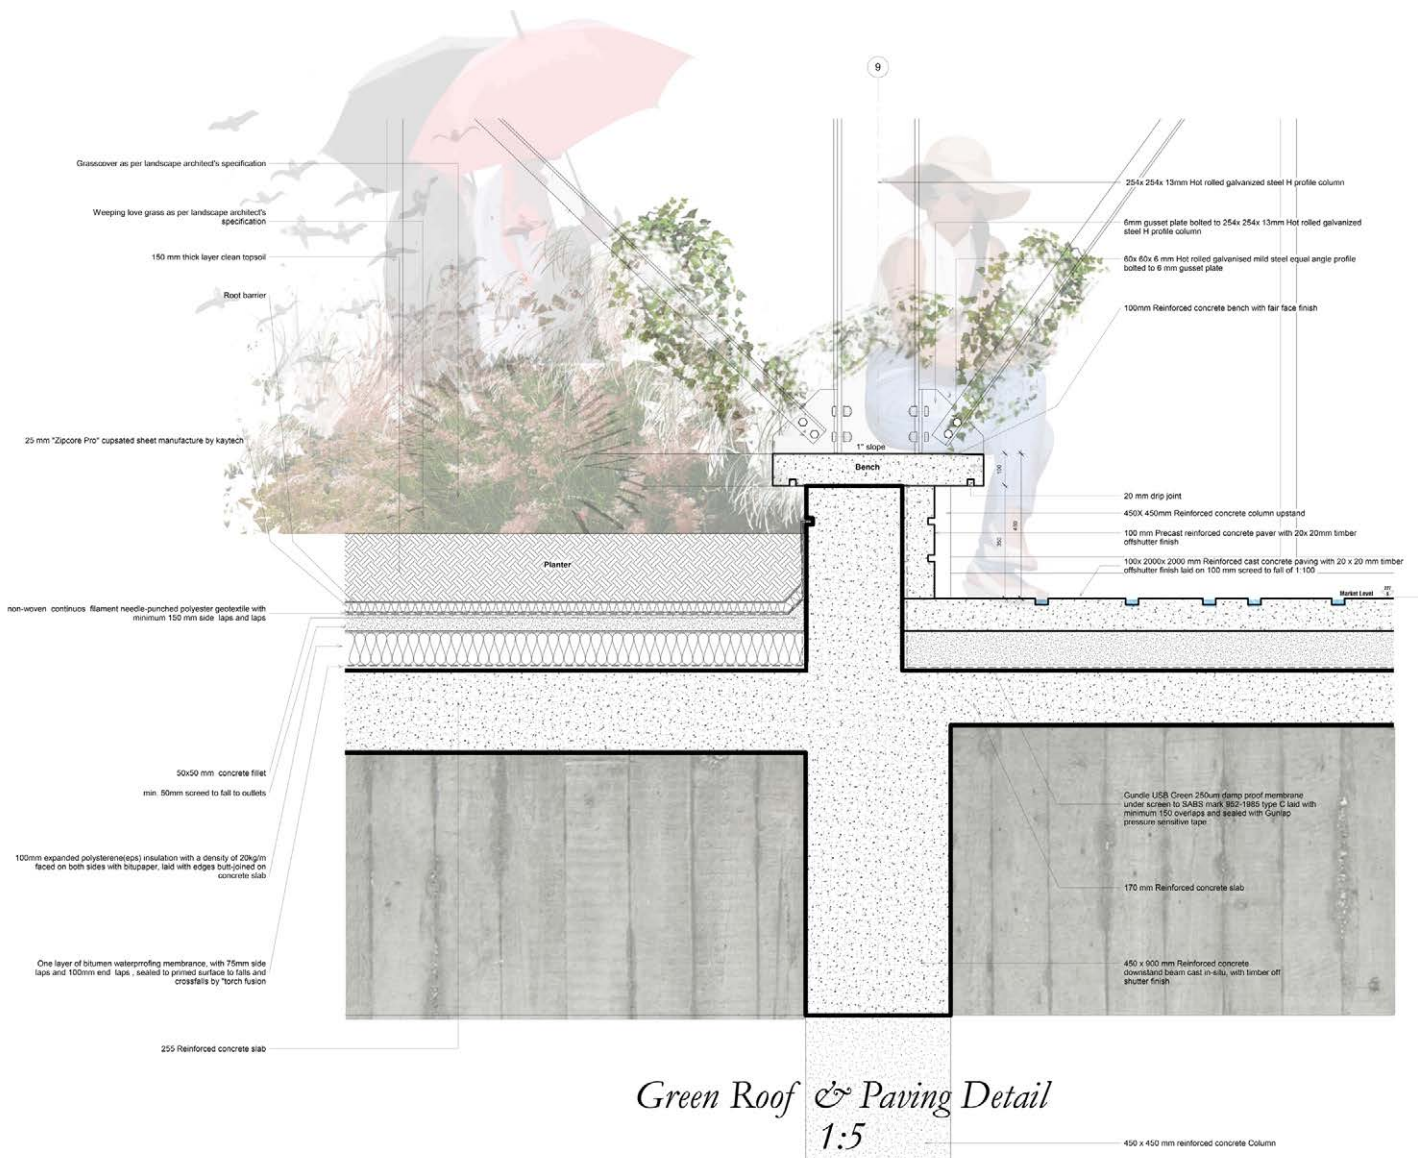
Green roof and paving detail referencing introduction of nature to urban space and the buildings relationship with water (Author 2018)
